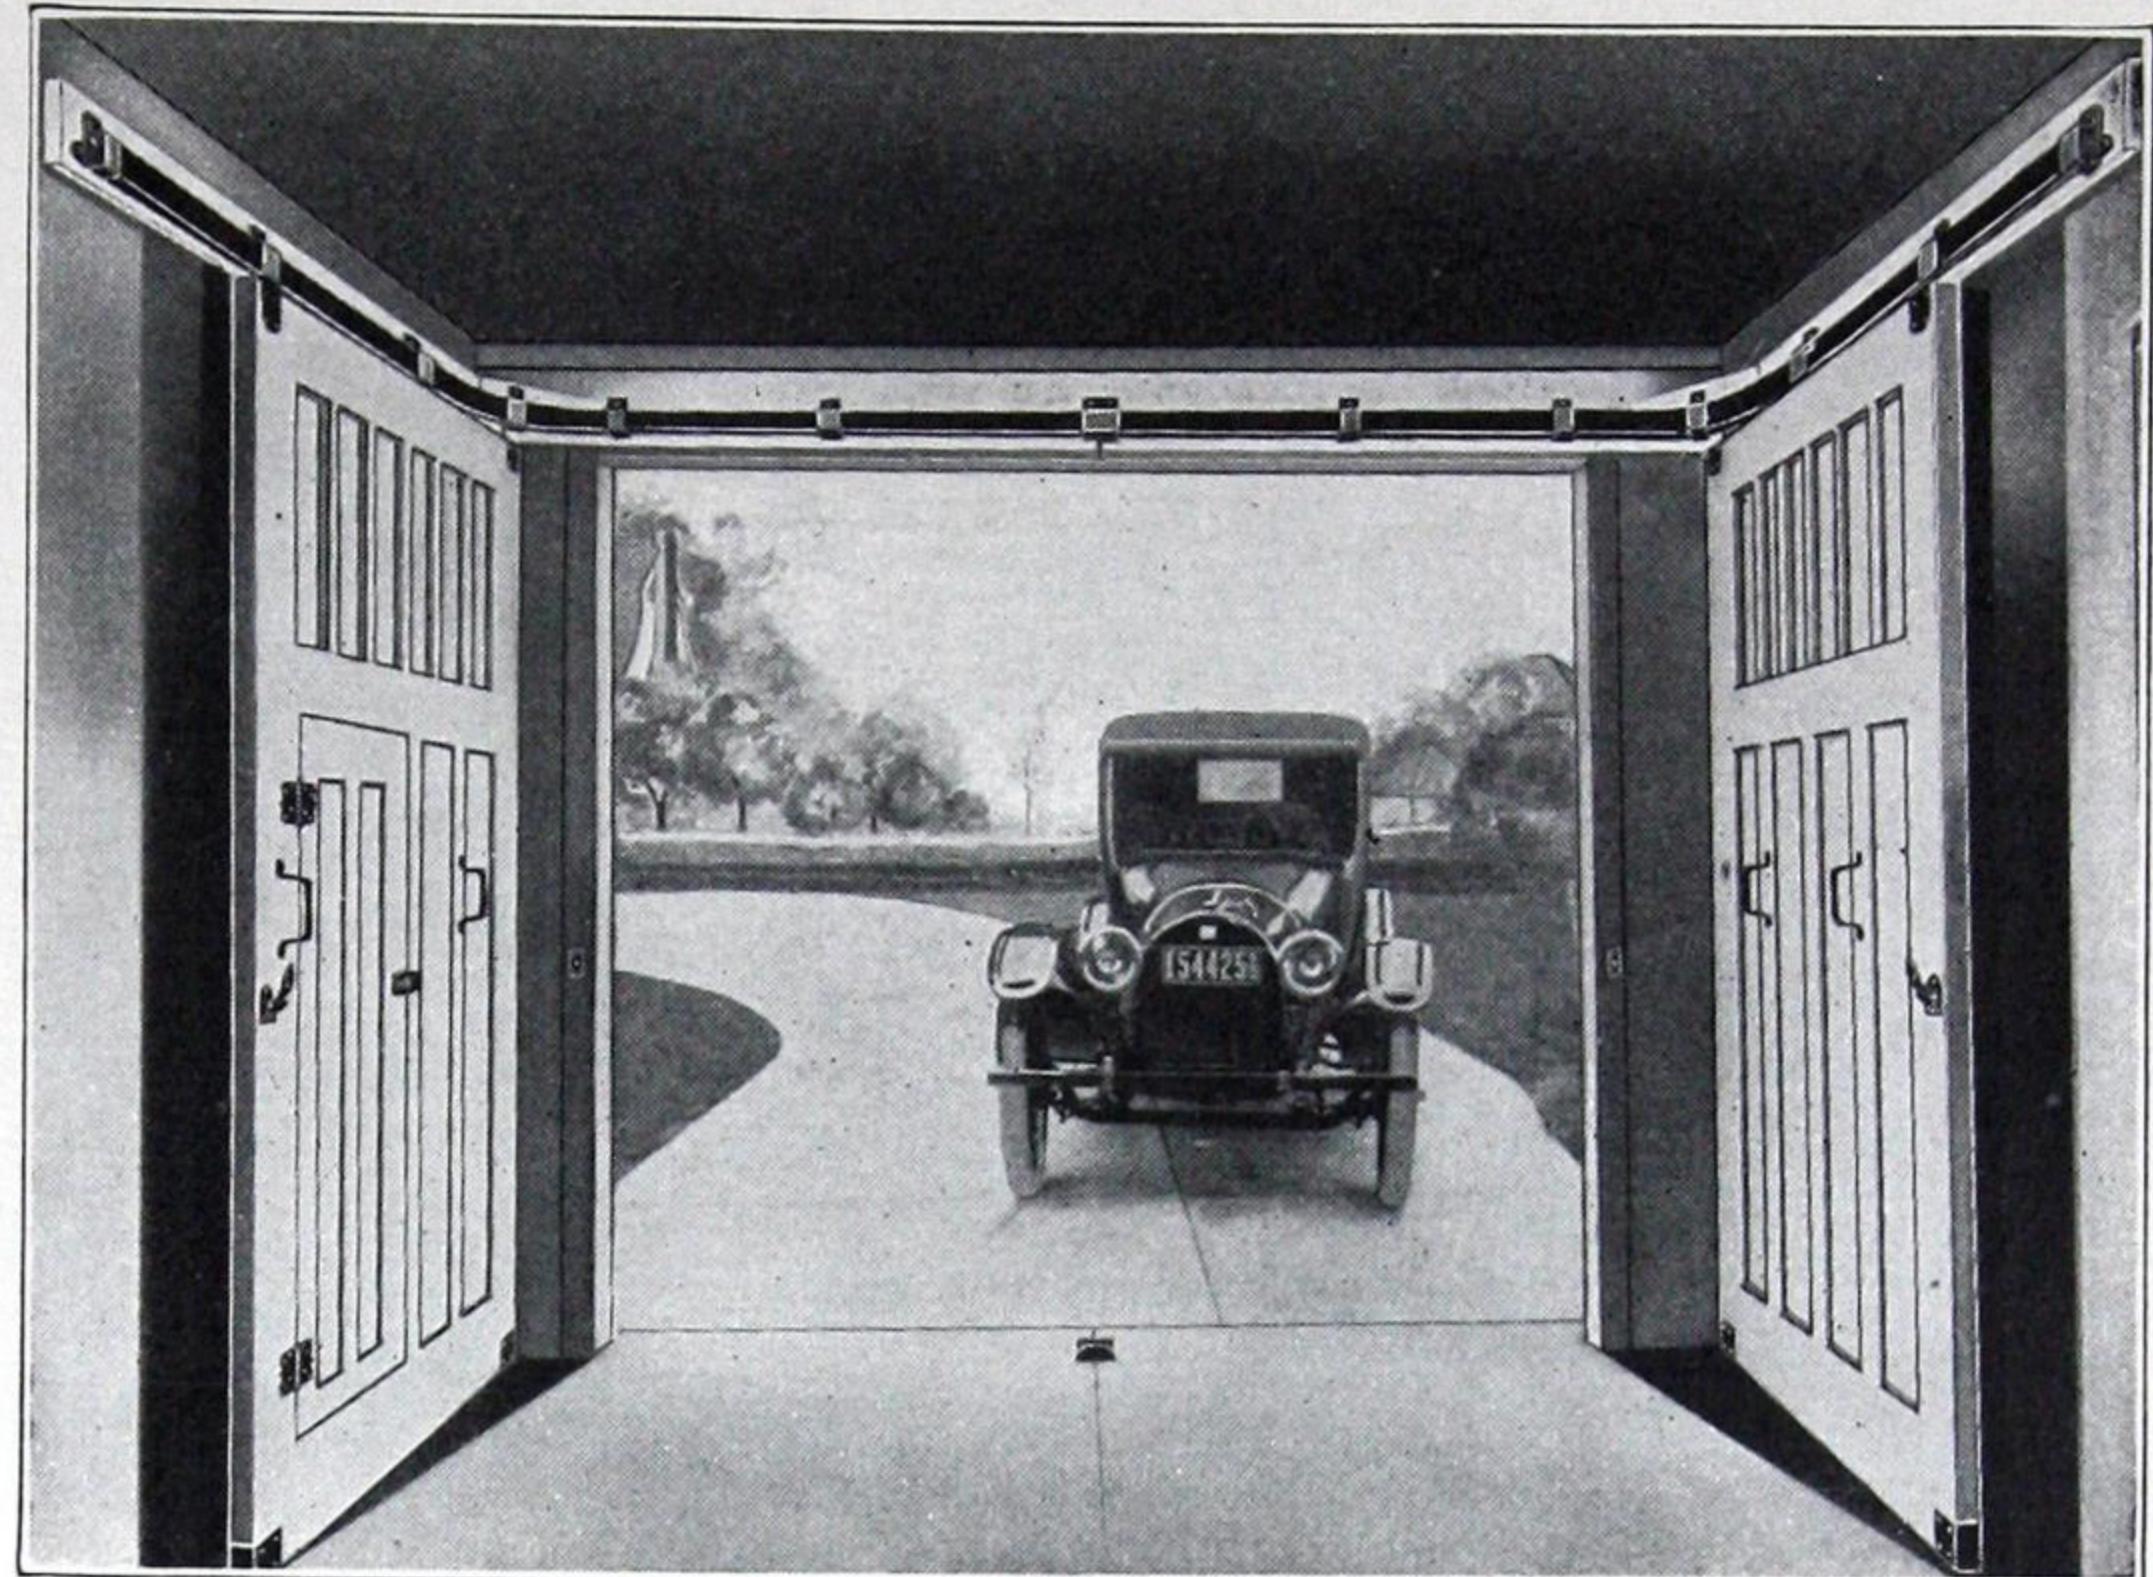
Interior View. Note the Wicket Entrance Door in Door on Left.
